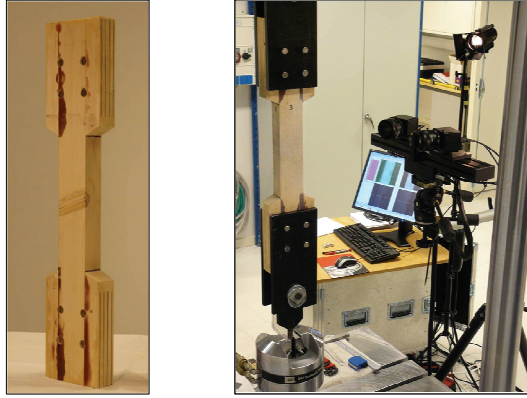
Test piece of dimensions $45 \times 70 \times 700$ mm with traversing edge knot (left) and test set-up for contact-free deformation measurements (right).
